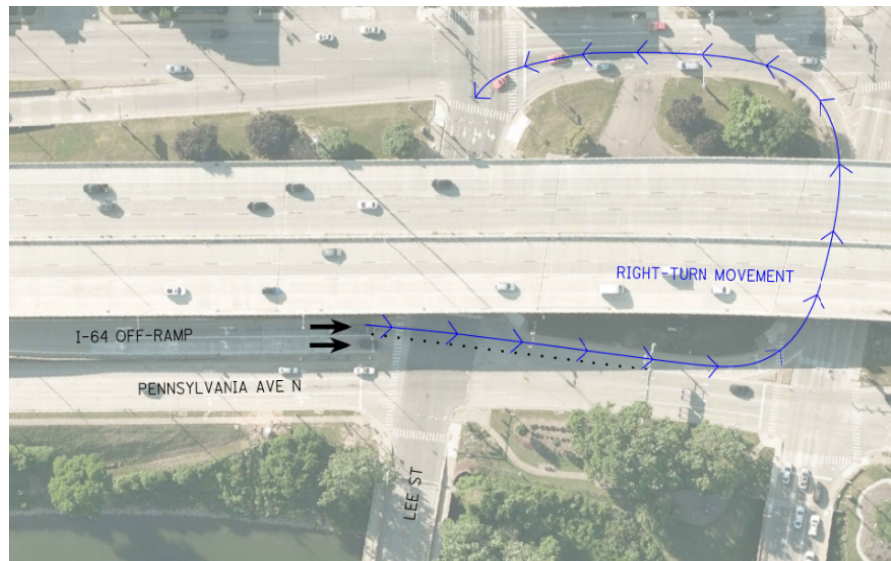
Re-Route Right-Turns for I-64 Lee Street Ramp
